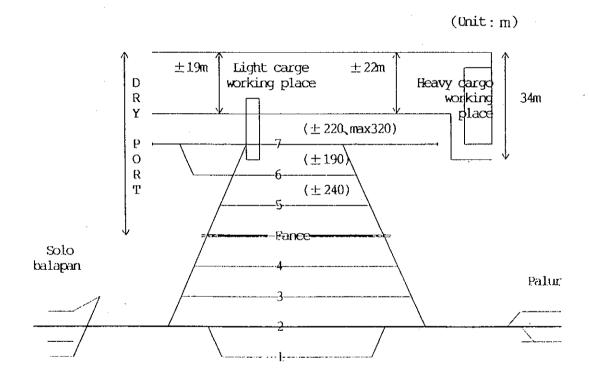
Solo Jebres Dry Port Track Layout Sketch
